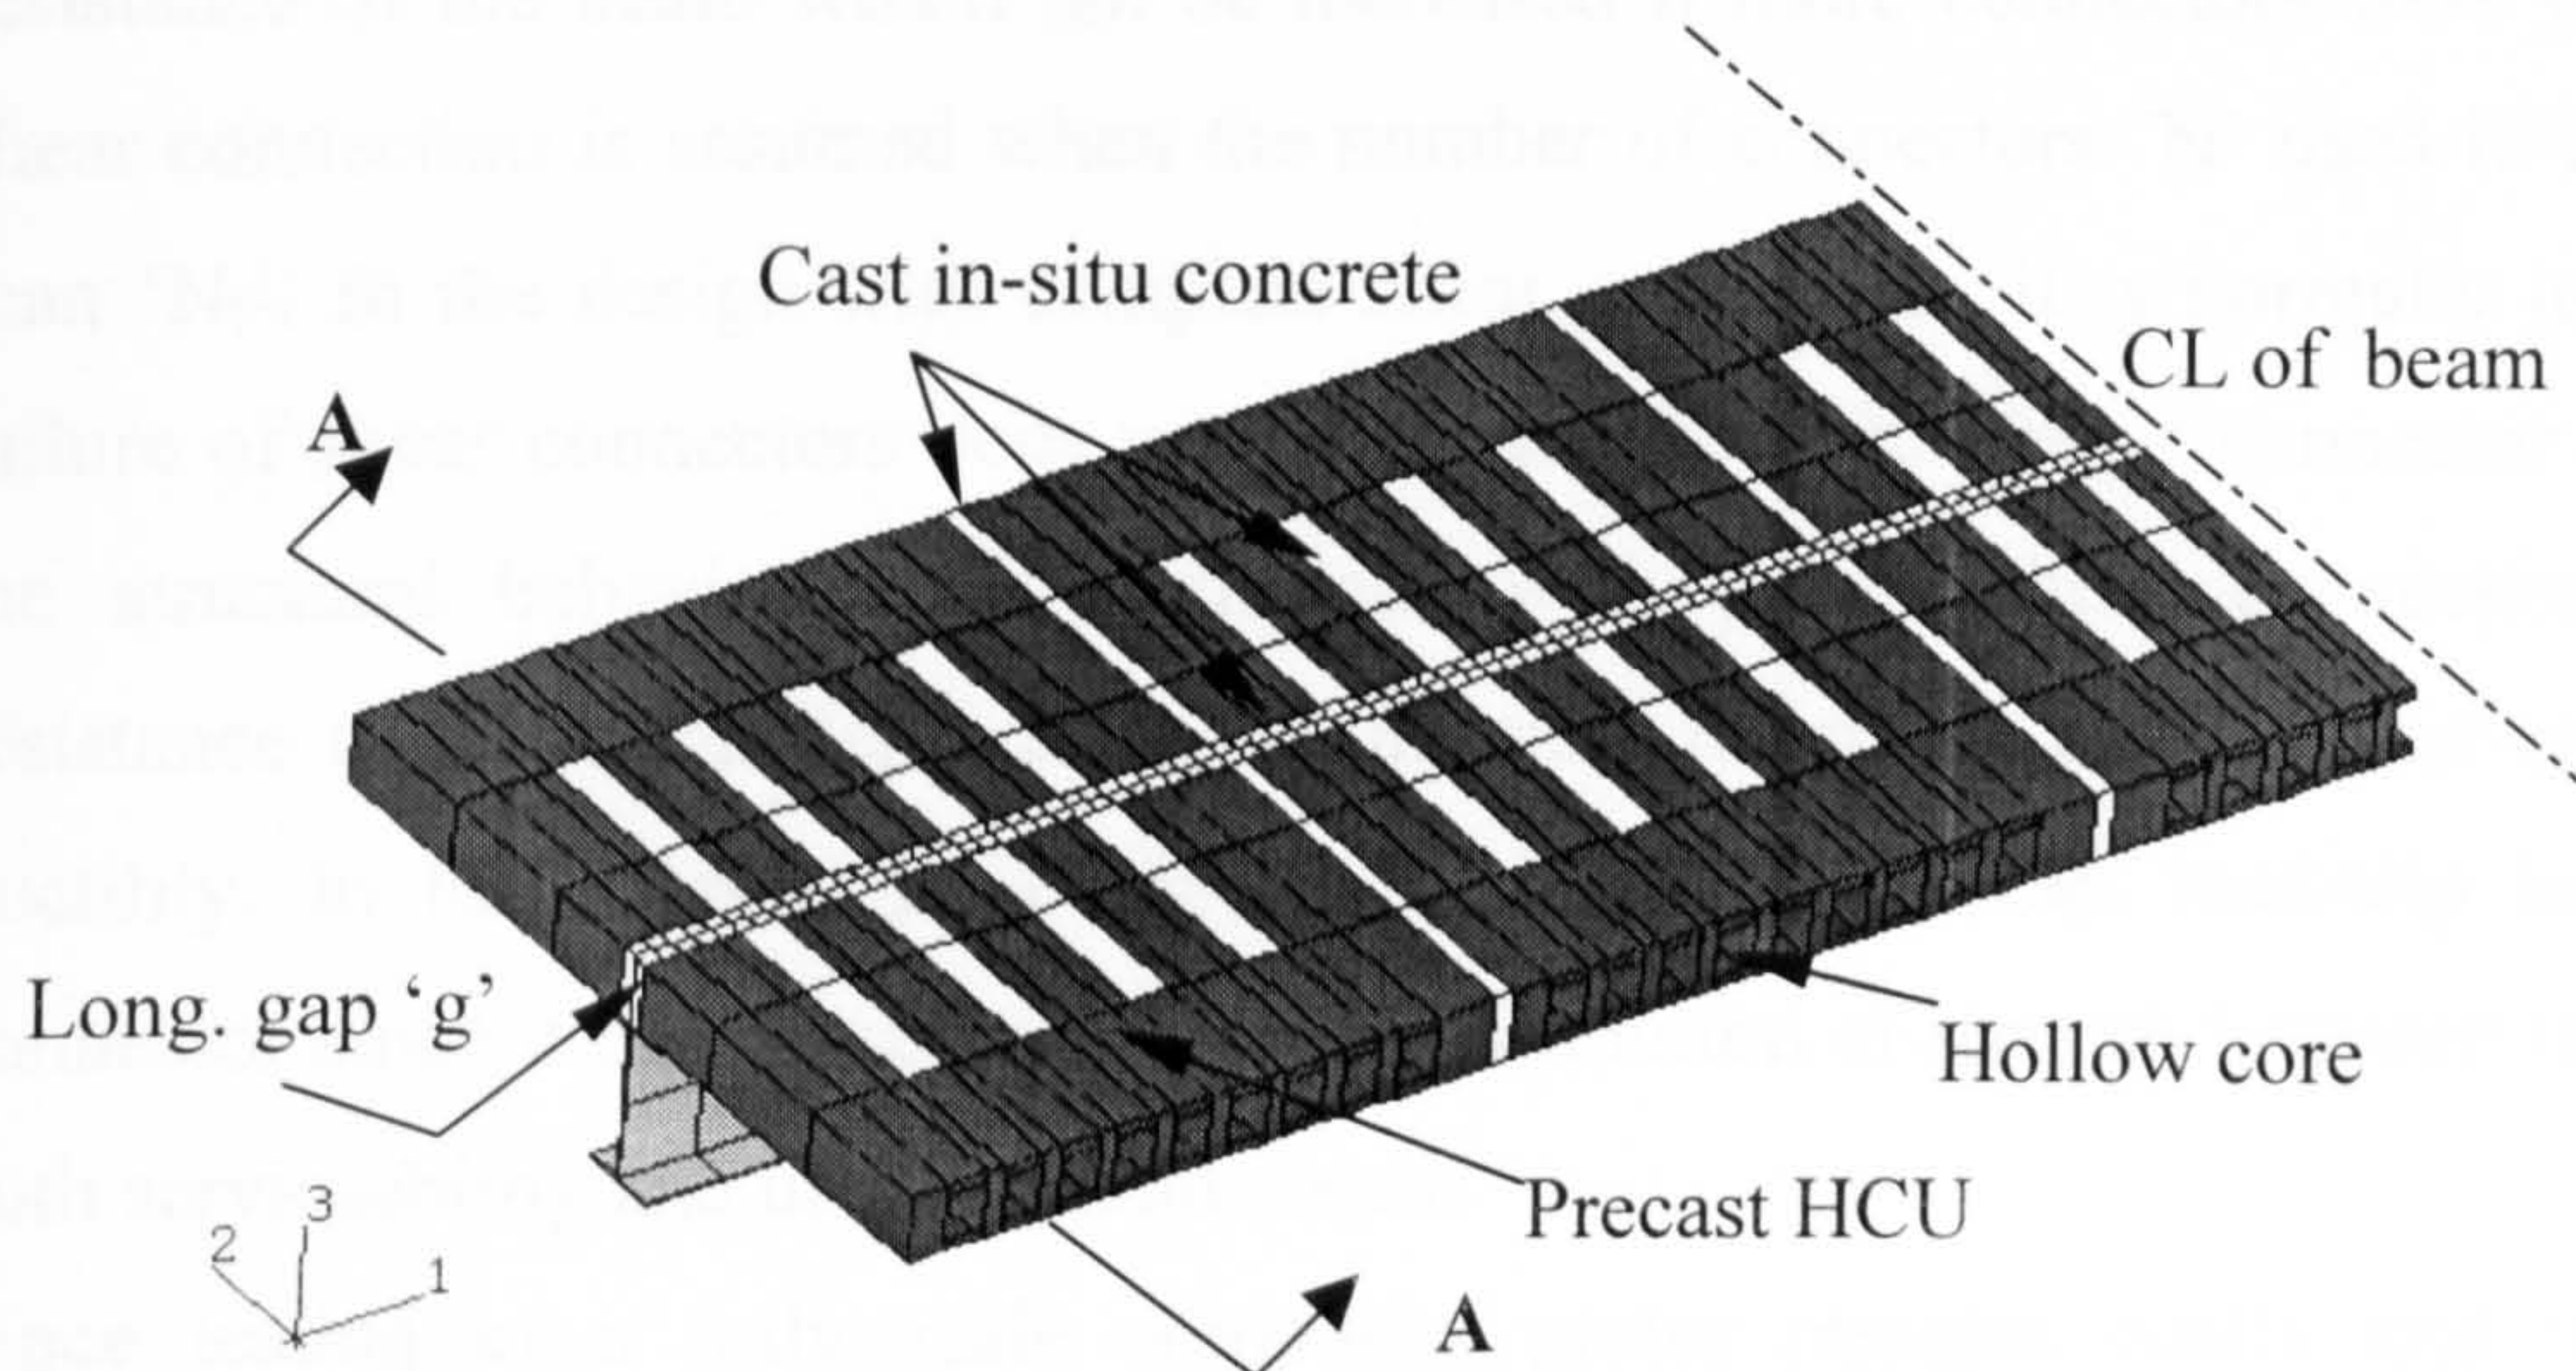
a General Layout of steel-precast HCU slab composite girder
